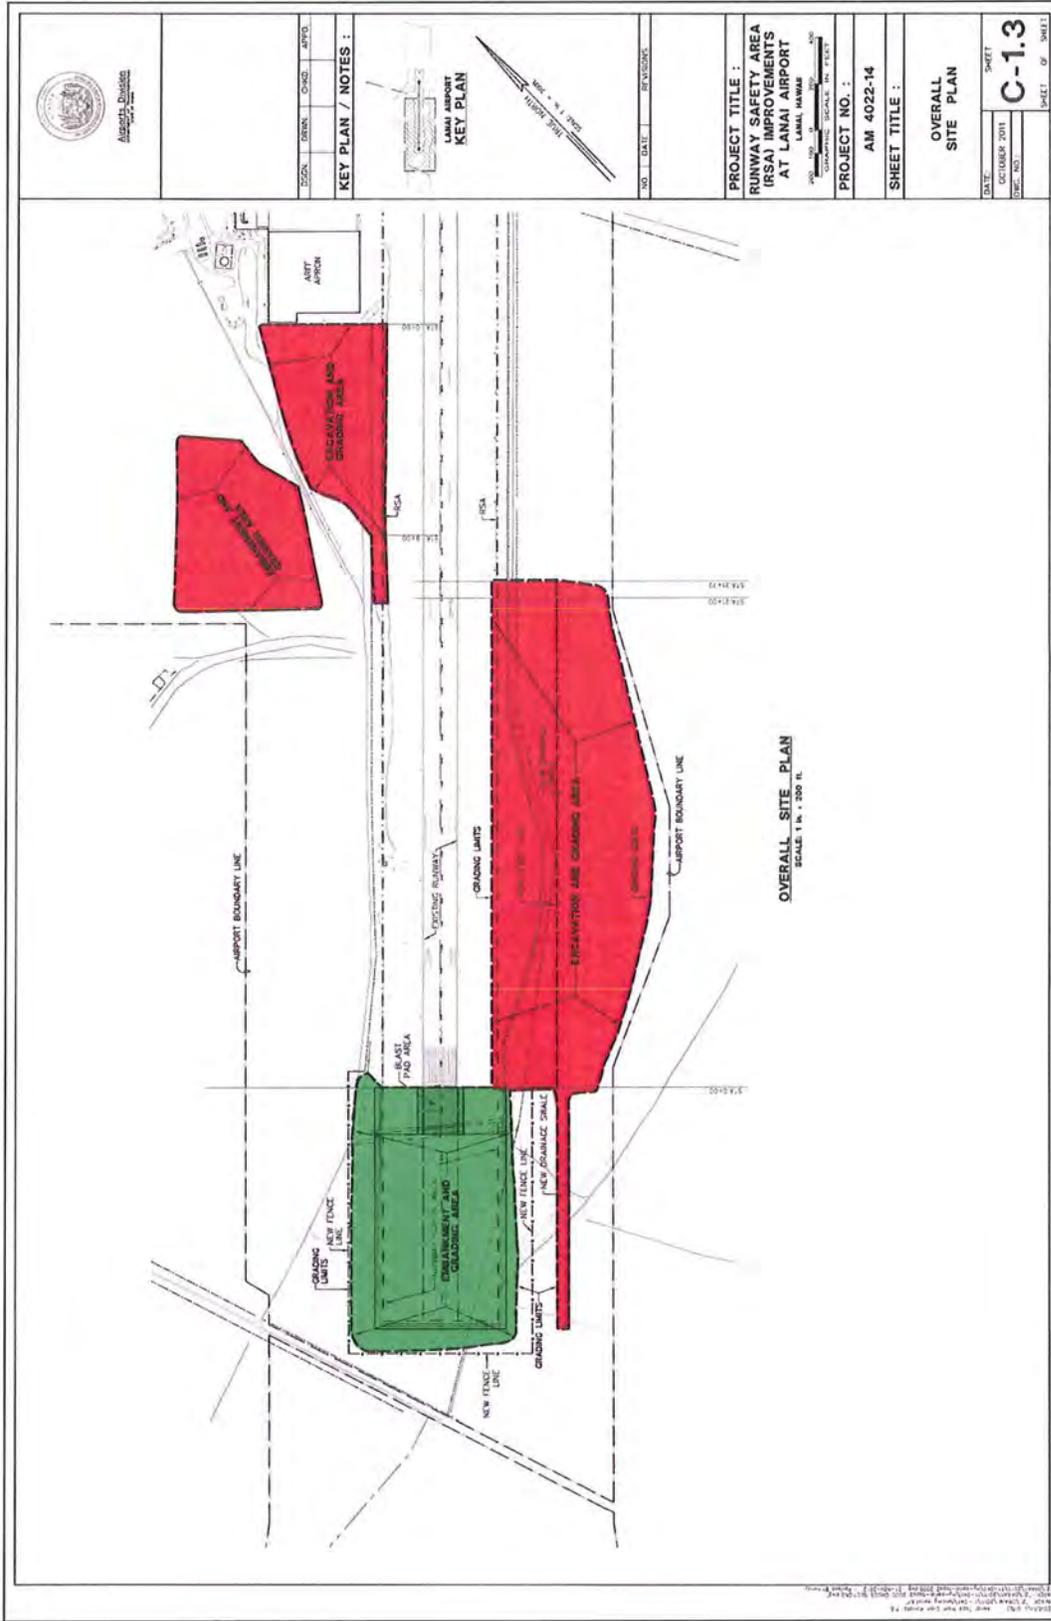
Overall proposed project site plan, excavation and borrow areas in red and surface grading and fill area in green.
